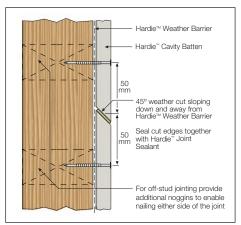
CAVITY BATTEN BUTT DETAIL
